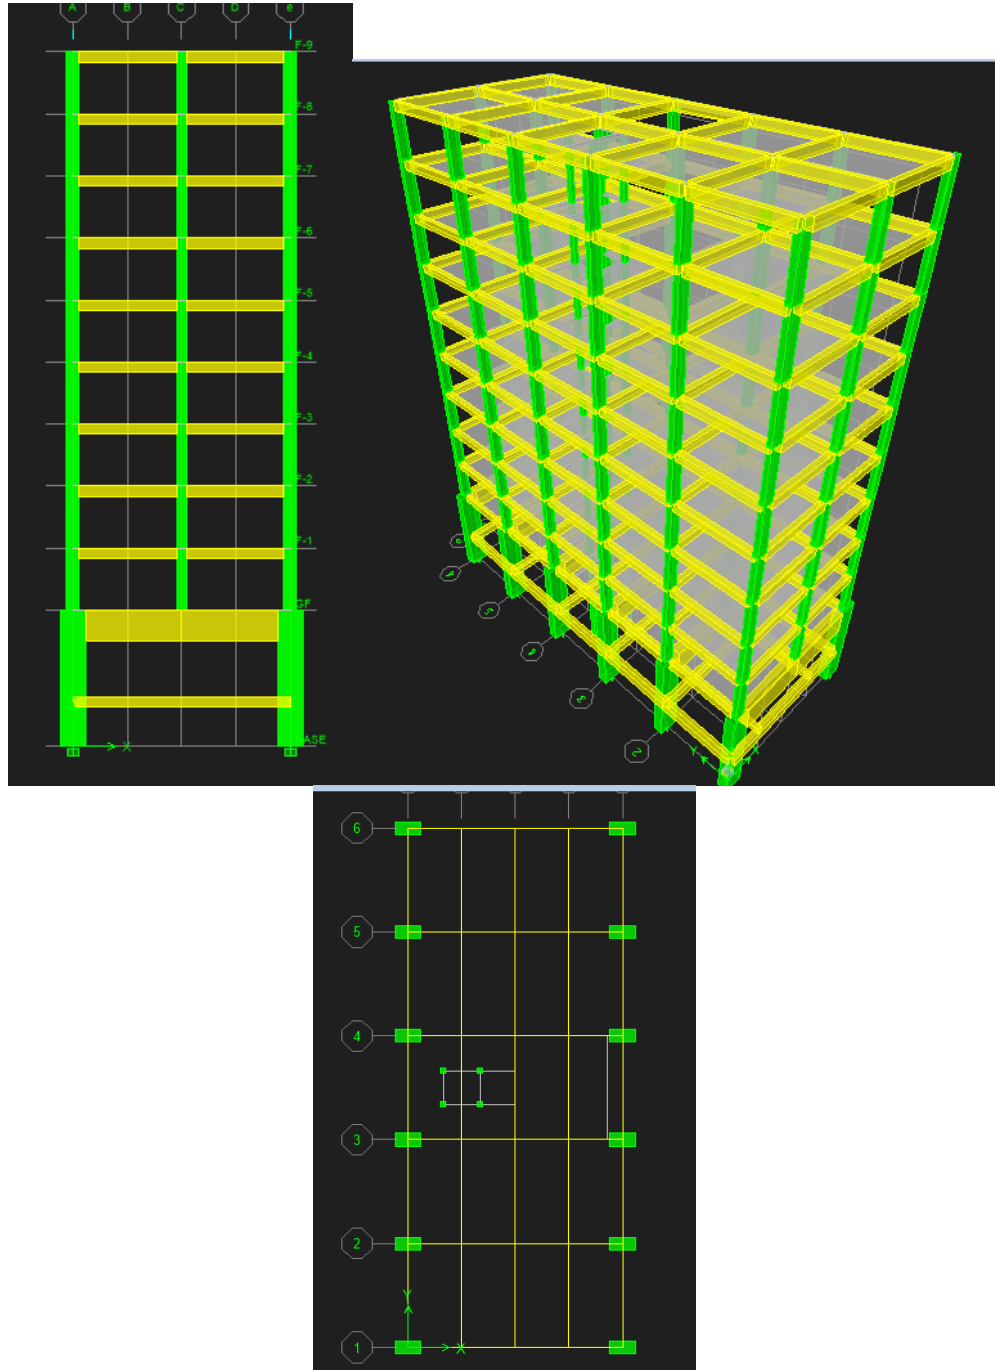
Elevation view, 3D view and ground floor plan view of case 3
